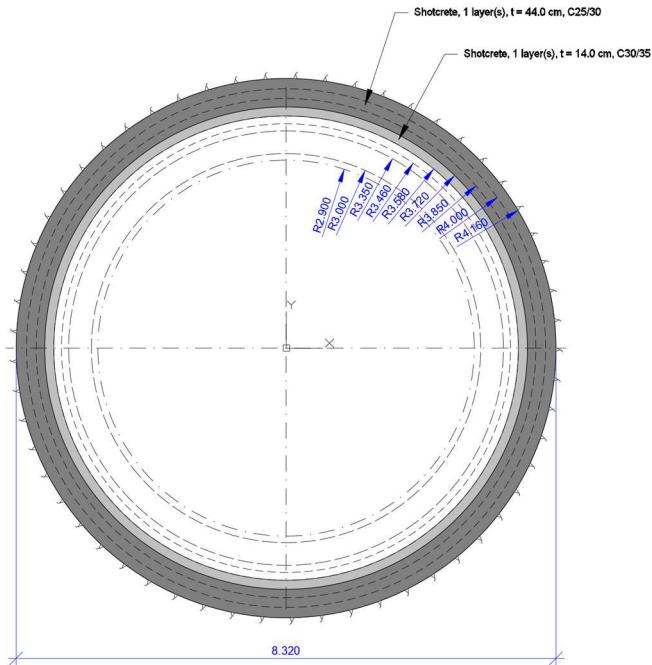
Cross section output on drawing – Shotcrete with no tubing
